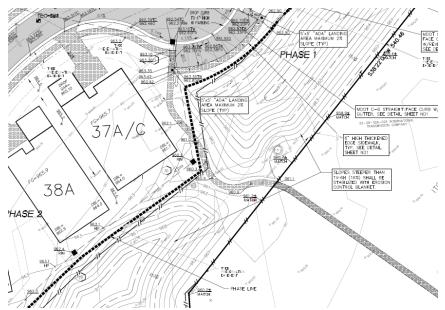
Phase 2 Final Site Plan, 2/3/2021
